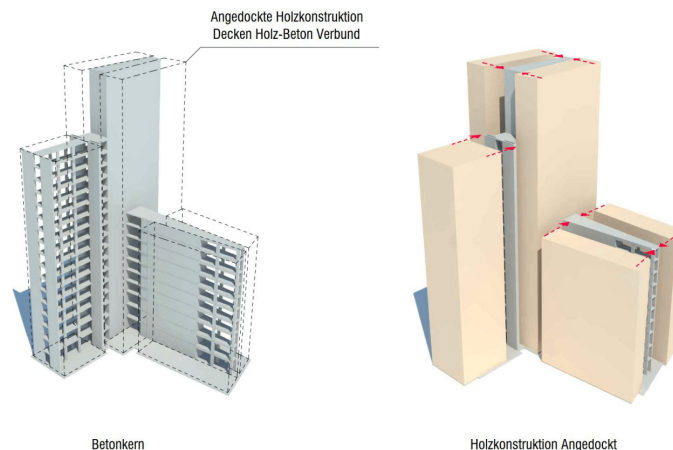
Structural overview of the concrete core and timber addition[70]
